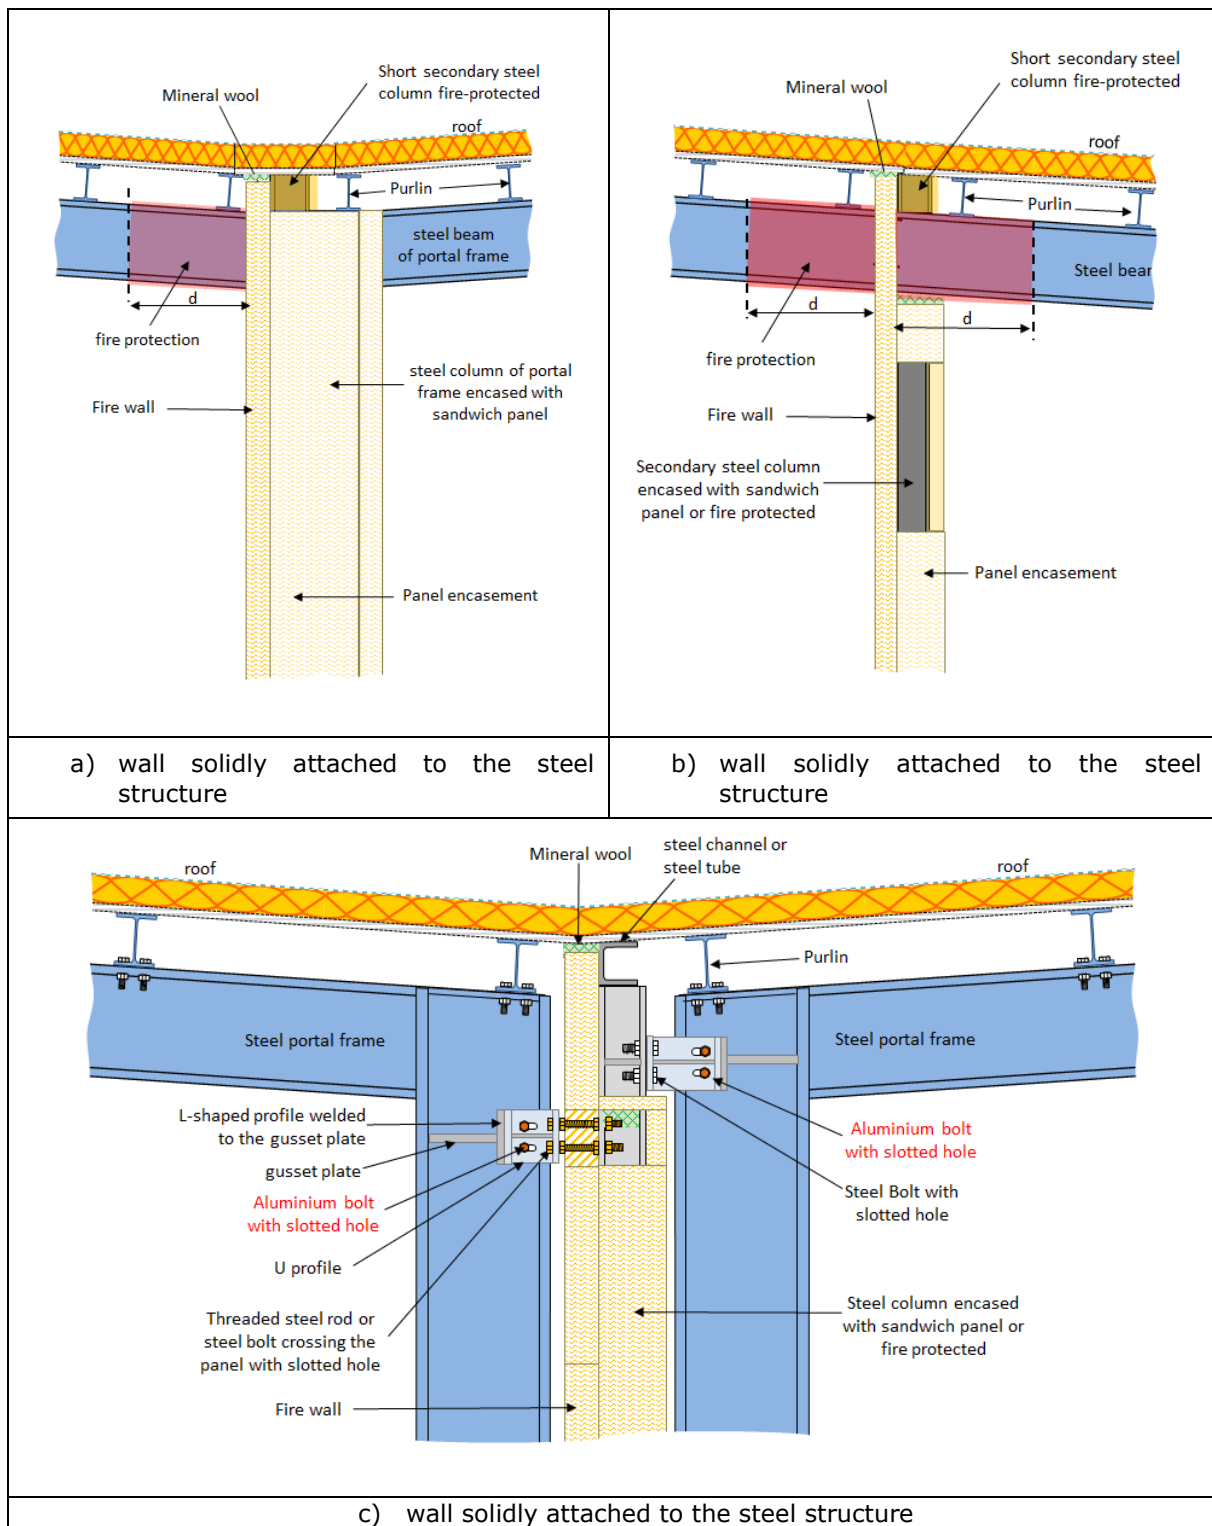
Schematic views for a fire wall perpendicular to portal frames, inserted into a row of columns and extending beyond the roof – Portal frame columns with standard fire protection
